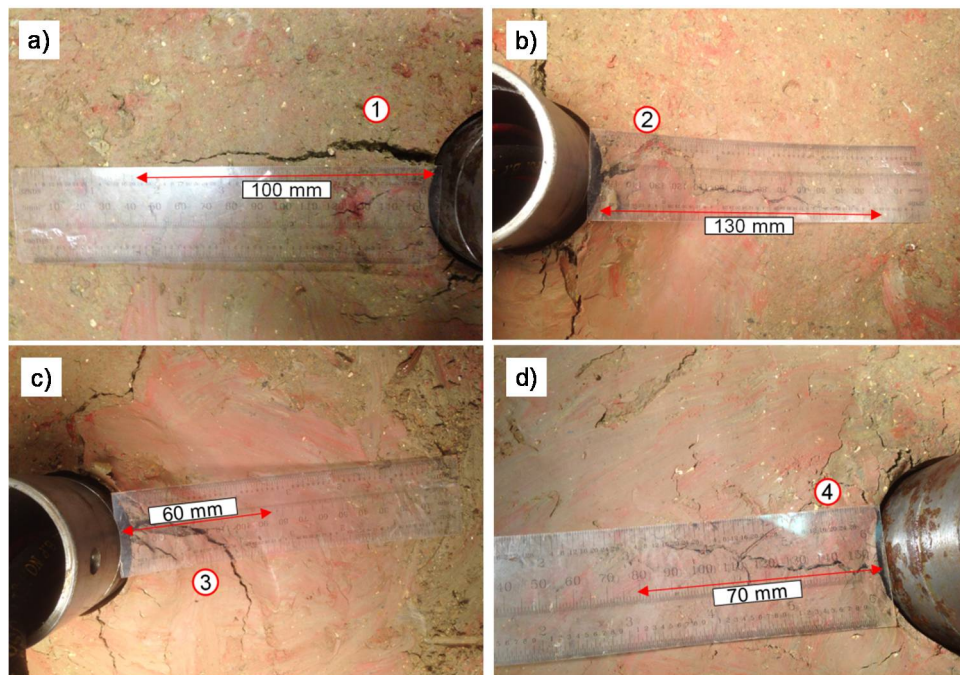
Details of four main cracks of cone penetration test in second soil chamber: a) Crack at position no.1, b) Crack at position no.2, c) Crack at position no.3, and d) Crack at position no.4
